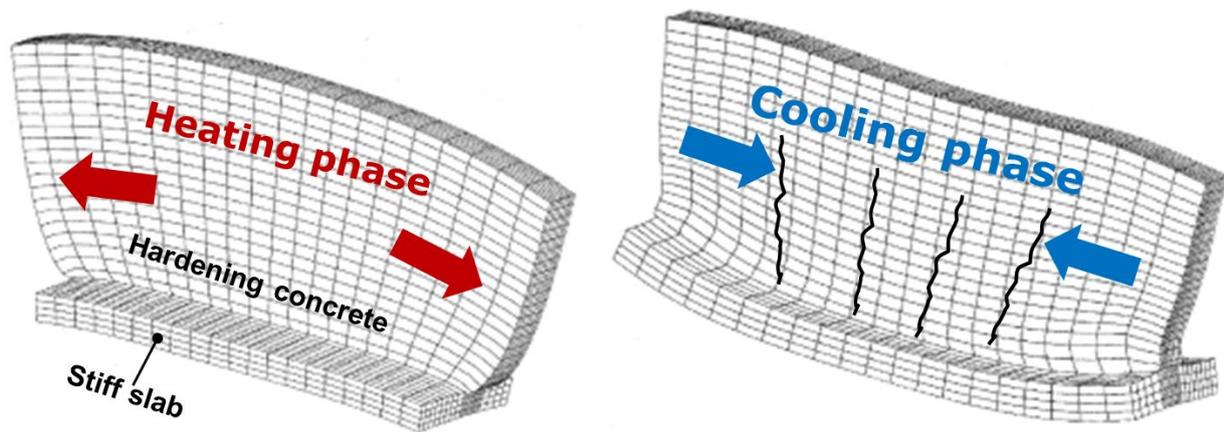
Deformation and possible through-cracking in a hardening wall (on-slab) concrete structure. The deformations are exaggerated. Based on FEM-analyses [1]
